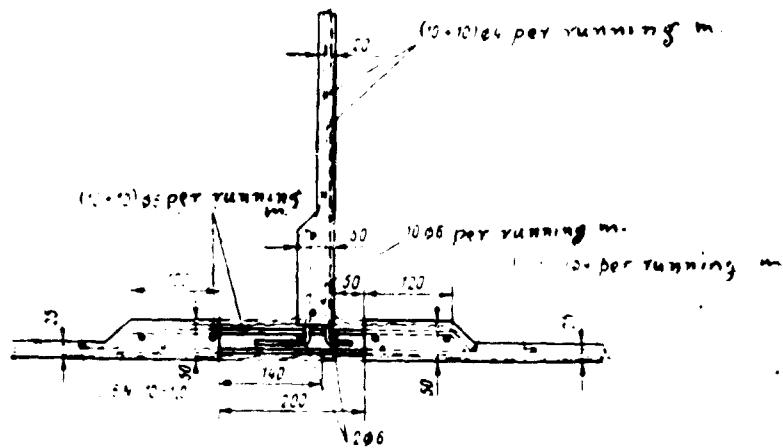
Connecting the Bulkhead Plates with the Bottom Plates.
